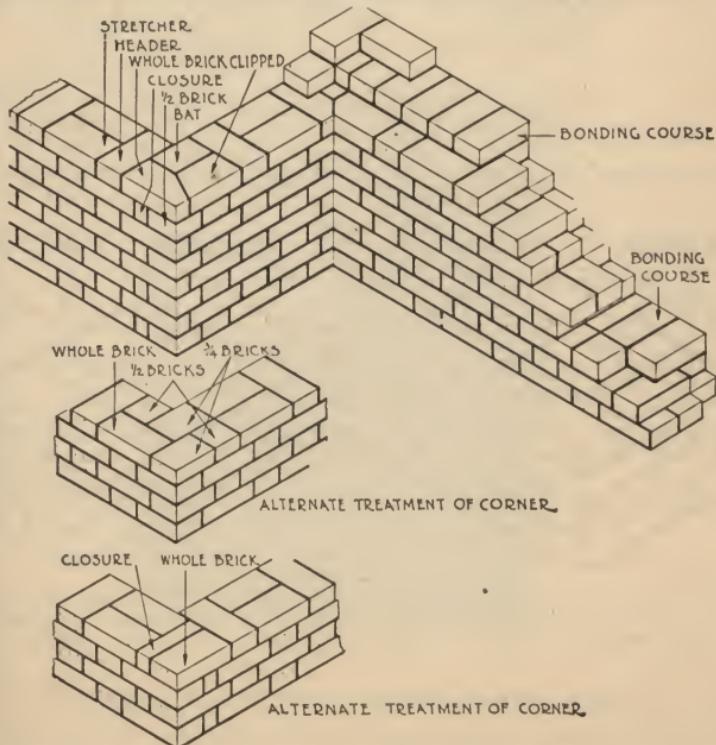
,230.—Outside and inside corners in English cross or Dutch bond, 8 and 12 in. walls.
